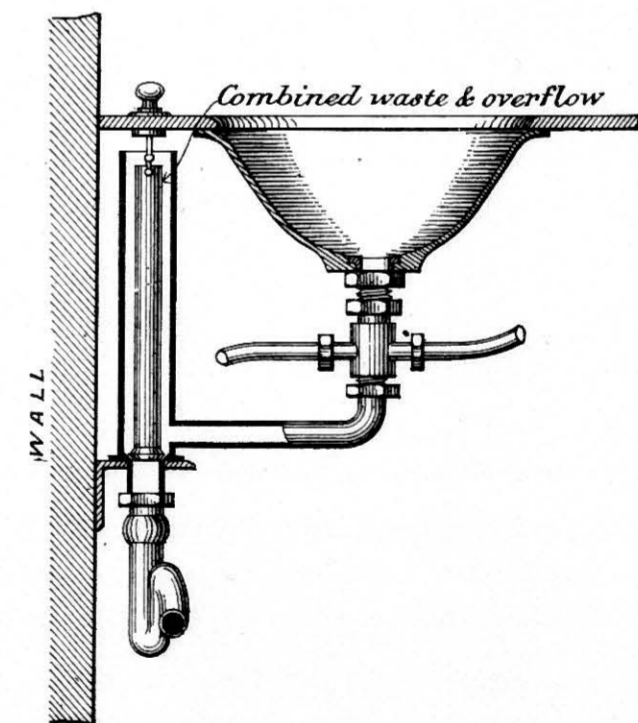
Section of Lavatory Basin, showing combined Waste and Overflow, and Water-supply through Waste-outlet.
